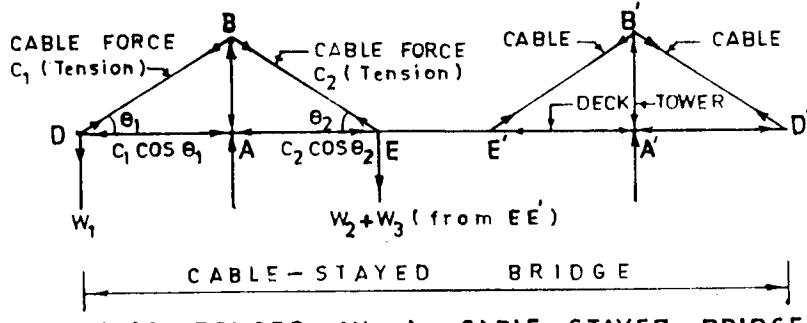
FORCES IN A CABLE STAYED BRIDGE
